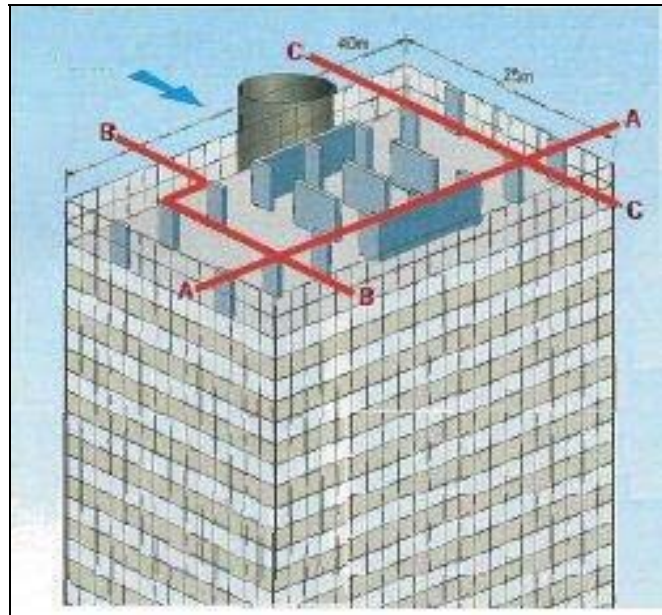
Structural system with line of failure AA, at 1.15am when the north façade falls off down to level 17, lines of failure BB and CC, at 3 to 5am when parts of the east and west façades collapse.
